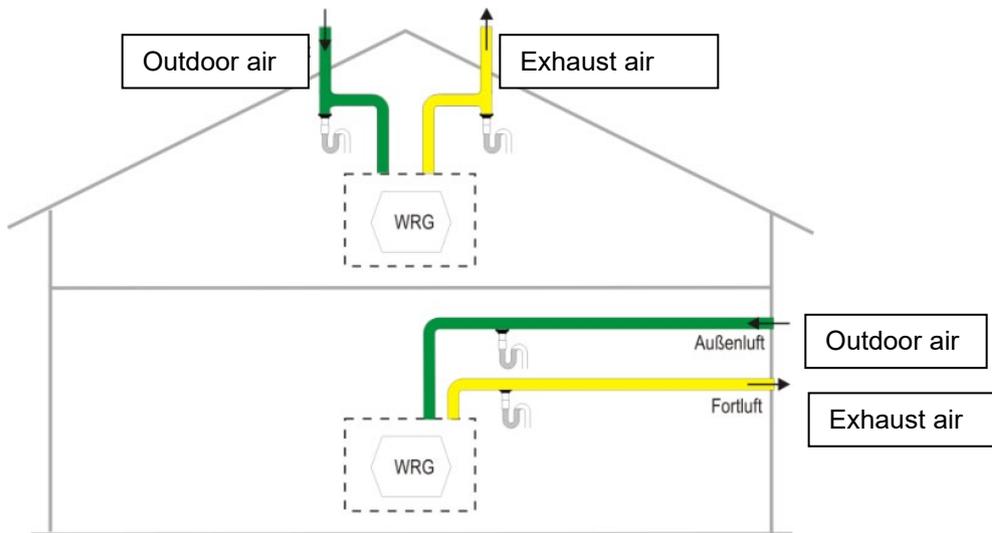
Drainage arrangement for outdoor and exhaust air tubes
